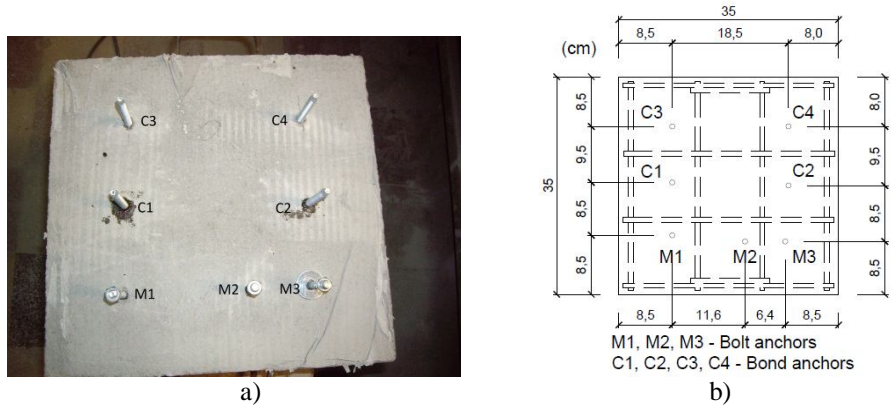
Anchors positions: a) on non-cracked specimen, b) toward reinforcement M1, M2, M3-bolt anchors; C1, C2, C3, C4 bonded anchors.
